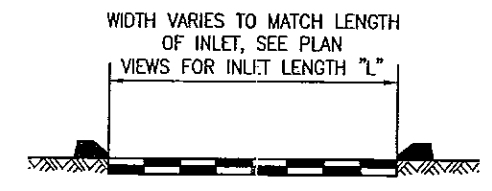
DETAILS OF BITUMINOUS CURBING ARE SHOWN ELSEWHERE IN THE PLANS.
